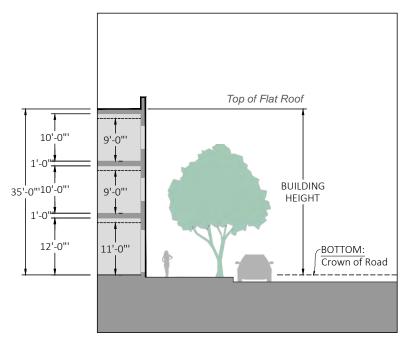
BUILDING HEIGHT (TYPE 1)
